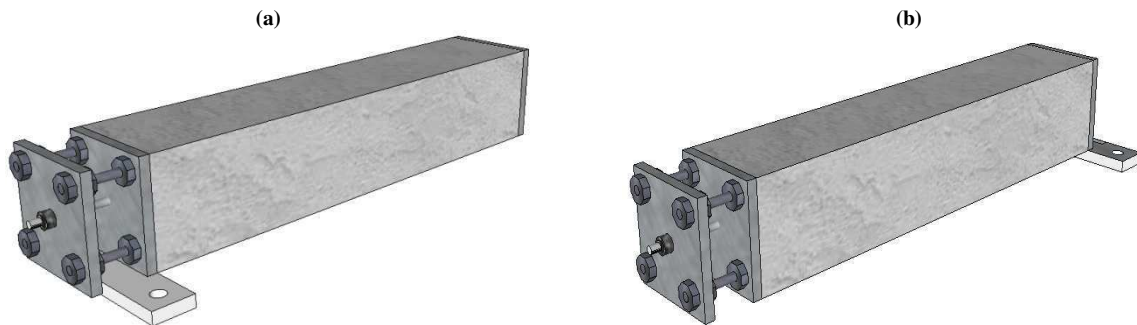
Specimen design: (a) Setup-1; (b) Setup-2
